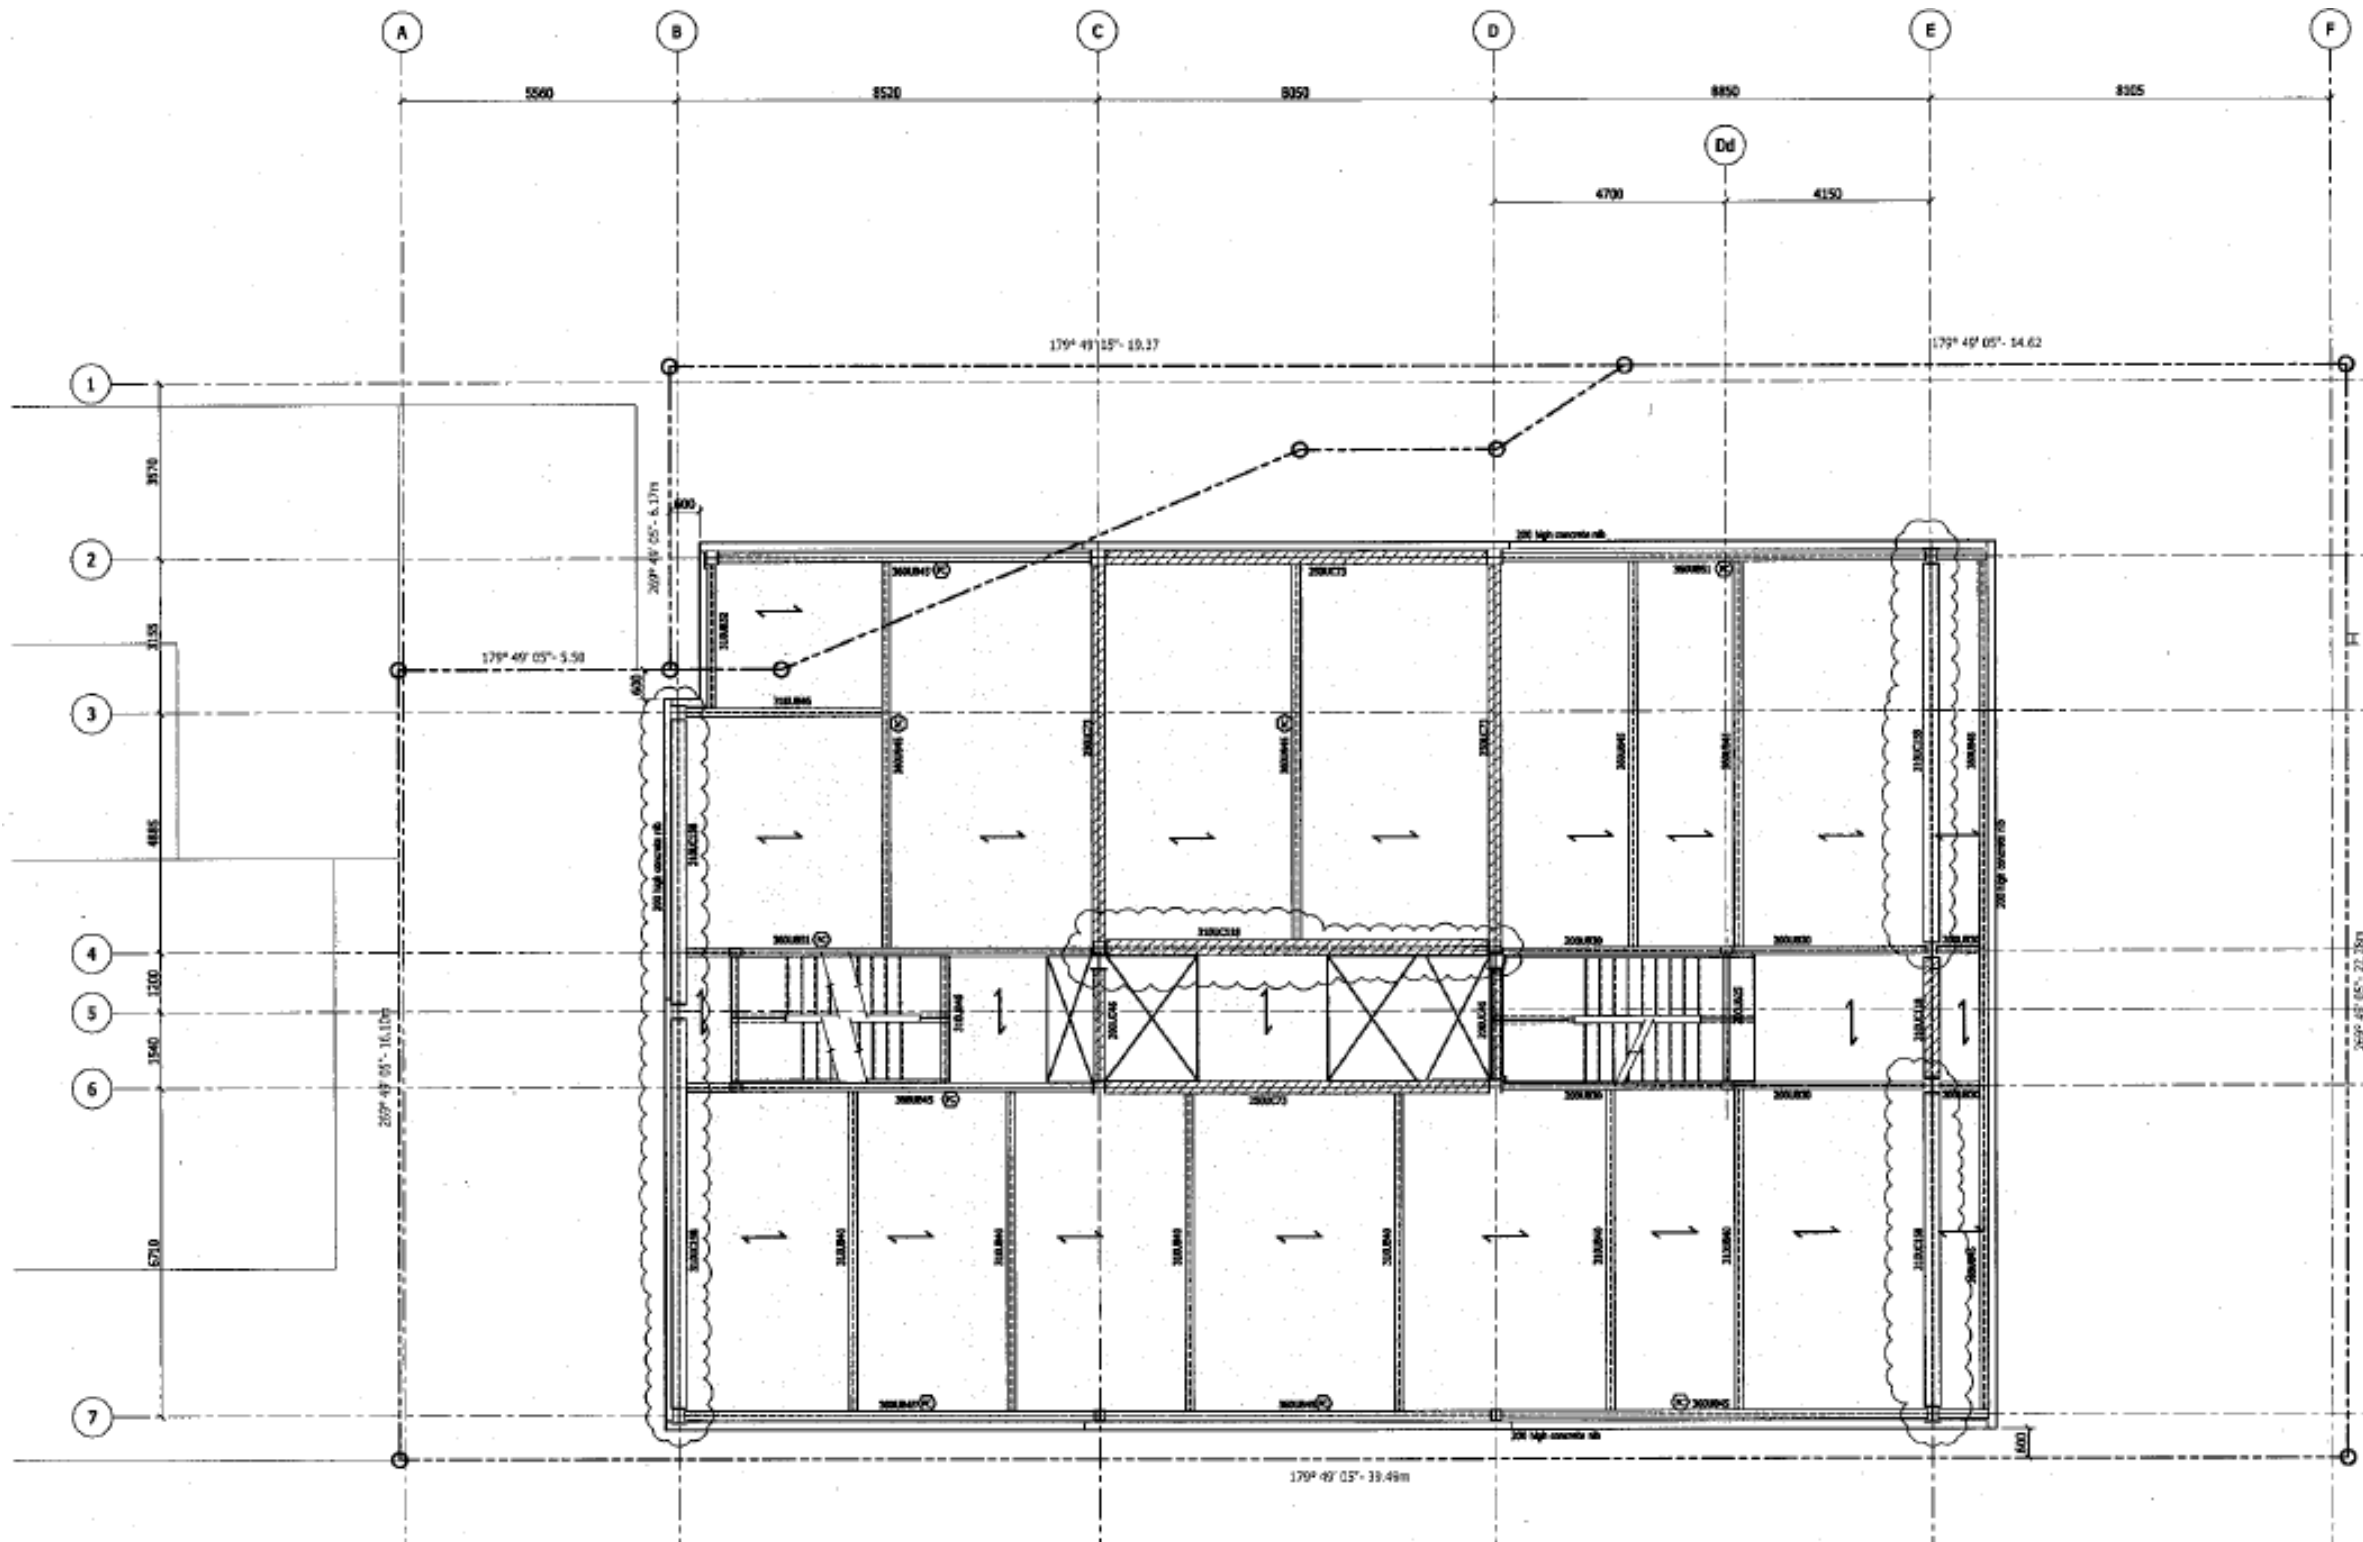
Structural Plan Level 21 (Christchurch City Council 2016c)
